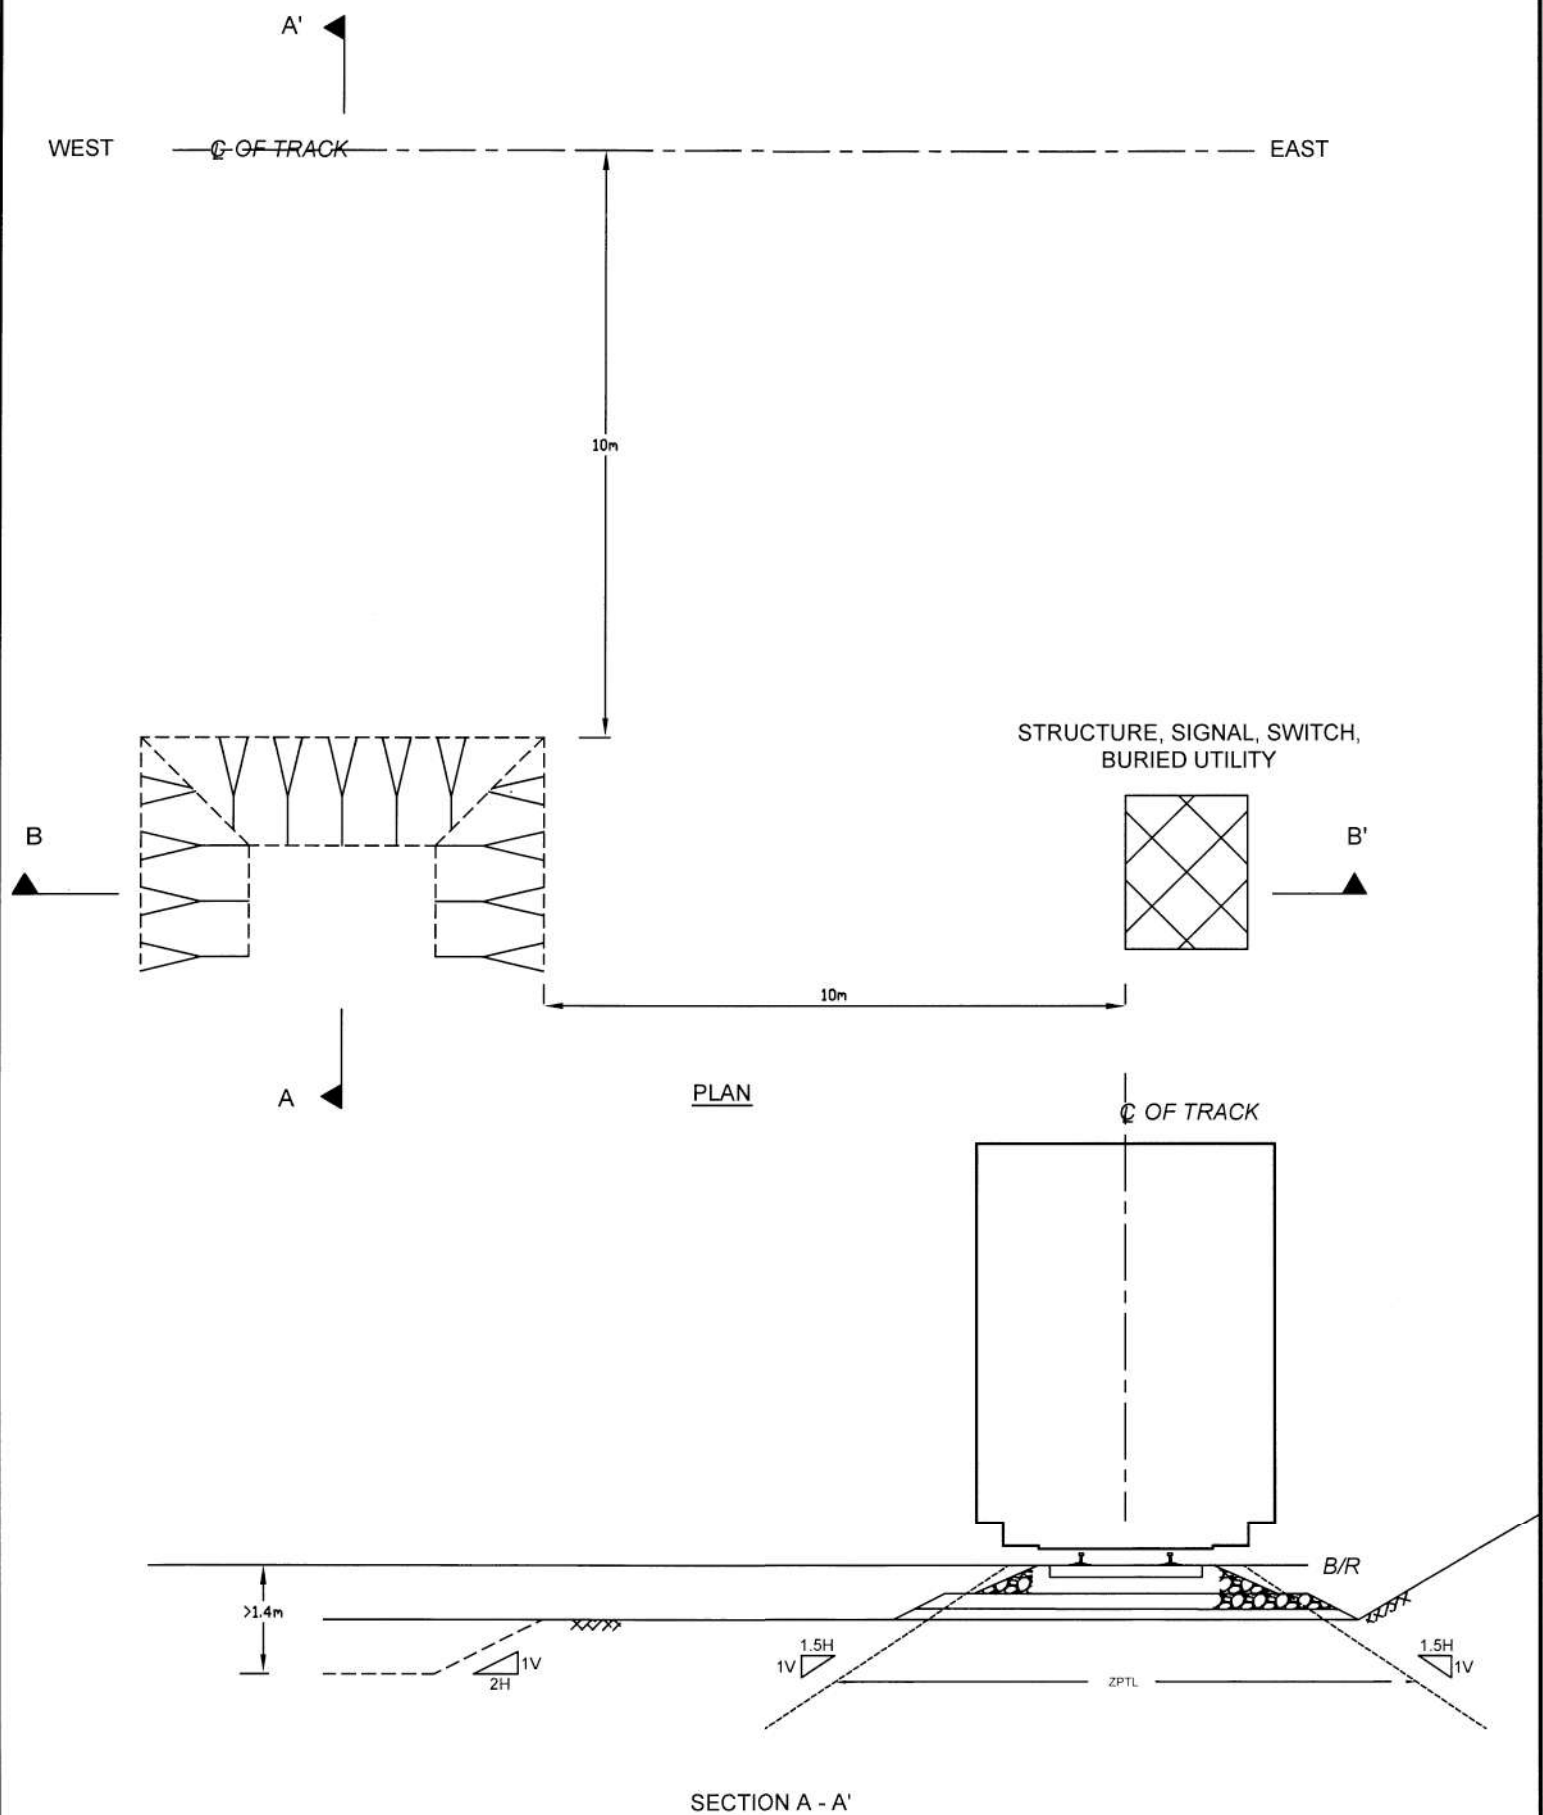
SECTION OF TRACK PERPENDICULAR TO THE CENTER LINE OF PROPOSED EXCAVATION
